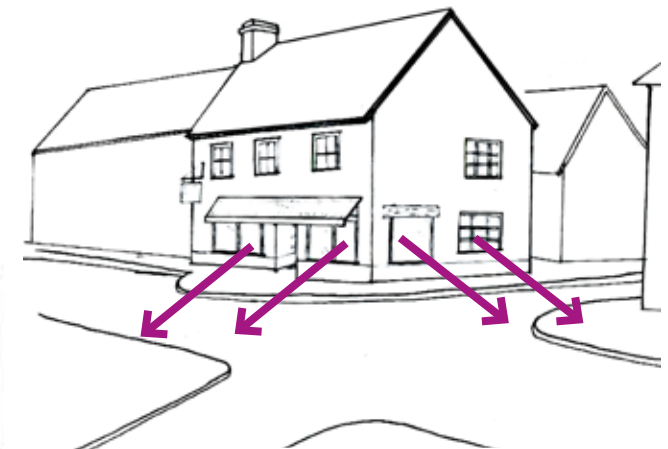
Windows on both streets facing façades provide enhanced natural surveillance.
